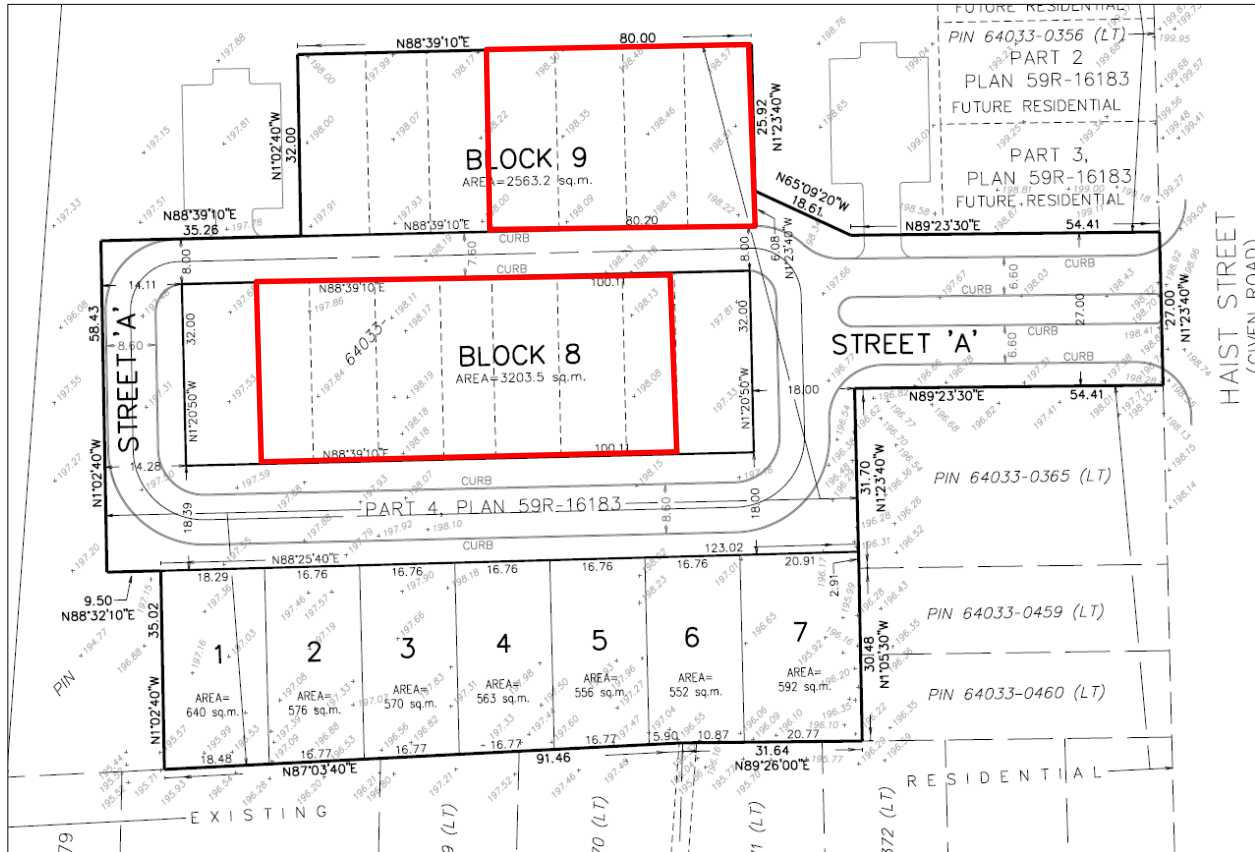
Draft Plan of Subdivision and Units Requesting Relief
